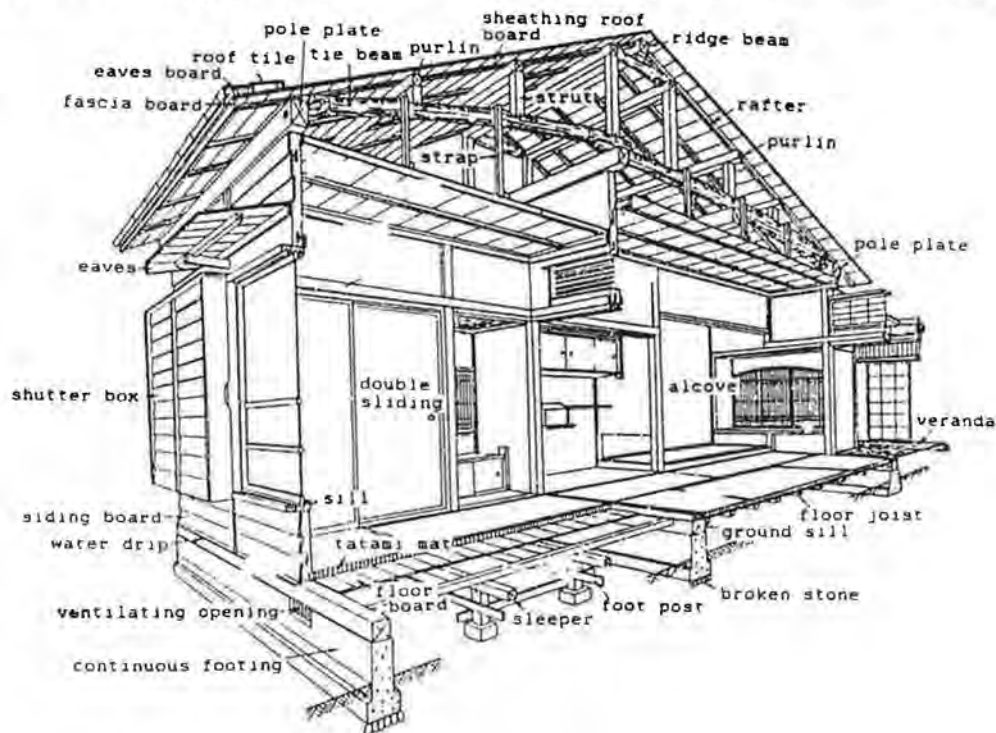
Architectural drawing showing details of traditional Japanese house.
